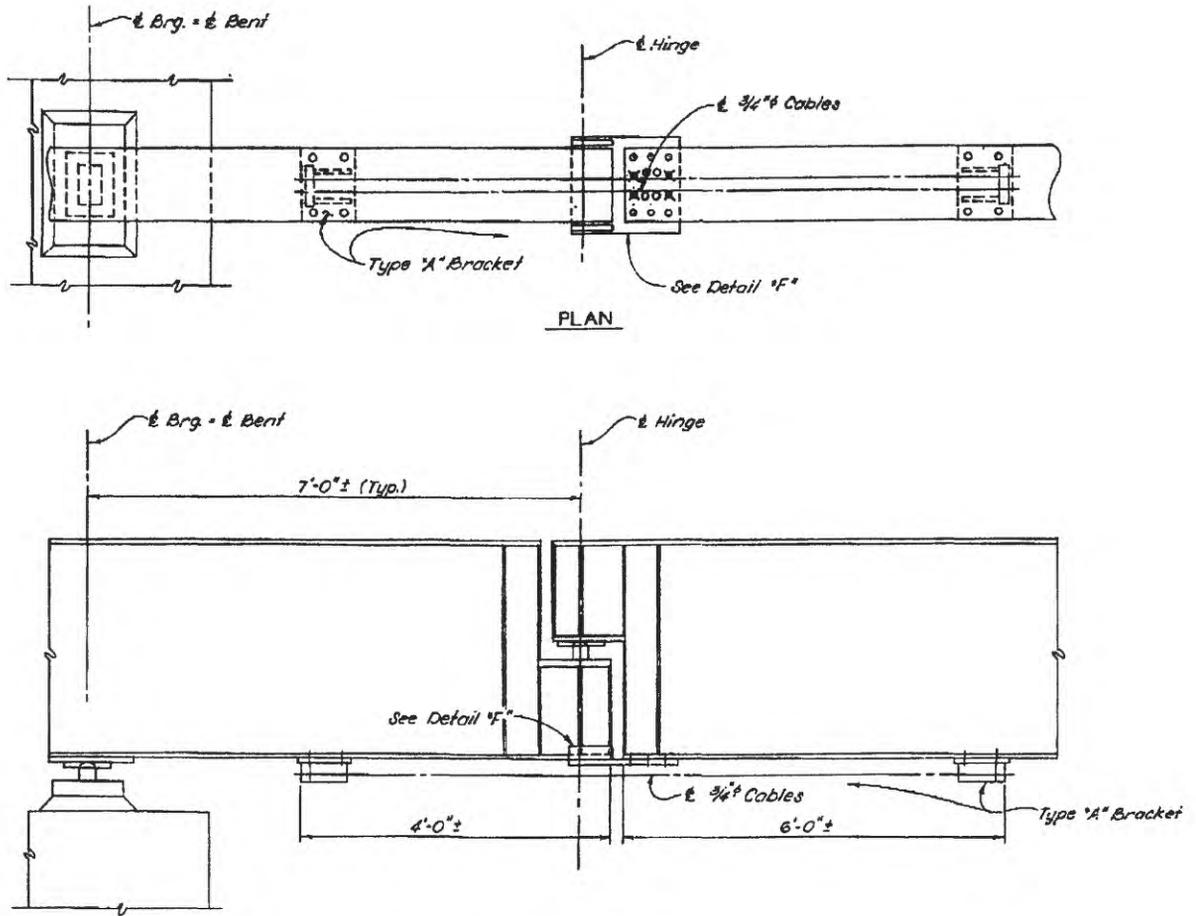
Elevation drawing for the 1985 retrofit of Fifth Avenue Overhead.
